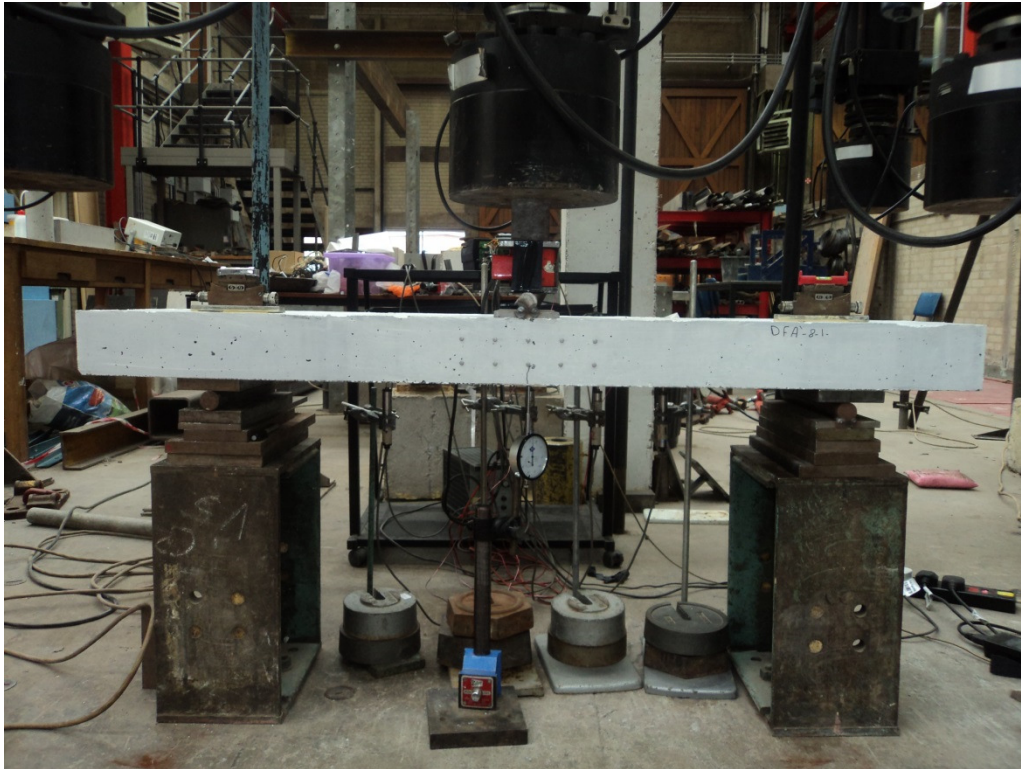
set up of concrete beam reinforced with steel mesh for ductility test
